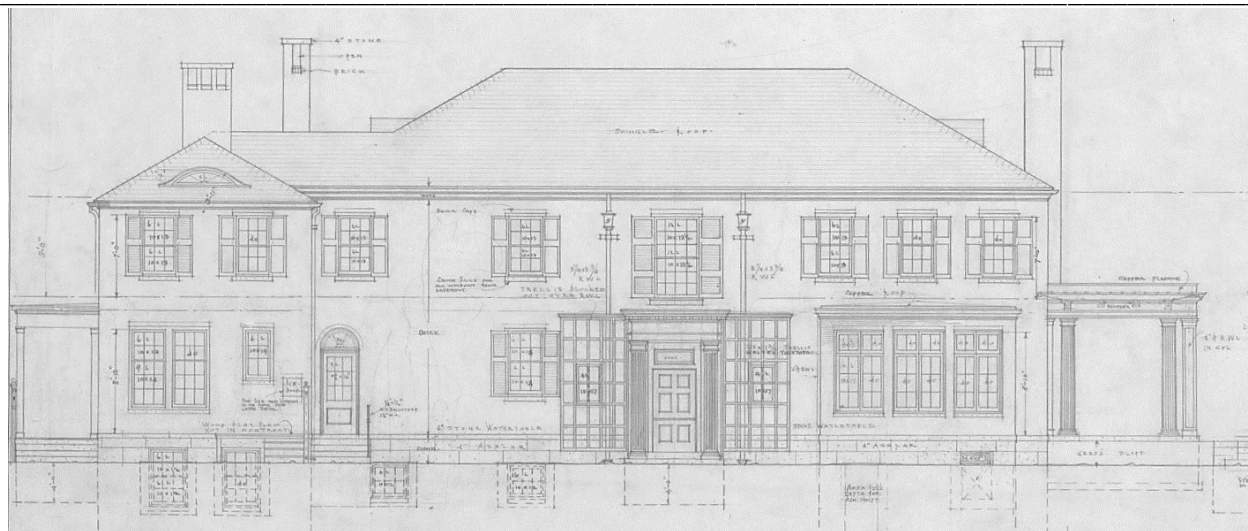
Julius & Carrie Feiss Residence, 1672 Oakwood Drive (#13), Façade West Elevation
